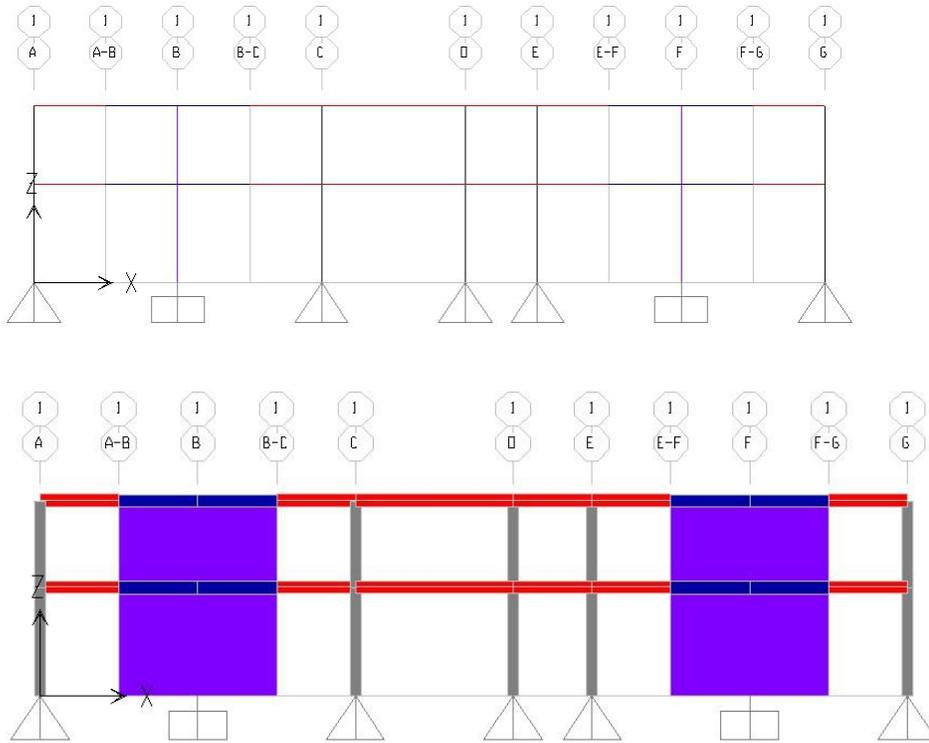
A 2-D numerical model of the retrofitted building (RS3): Frame 1 (RC shear walls shown in purple color).
